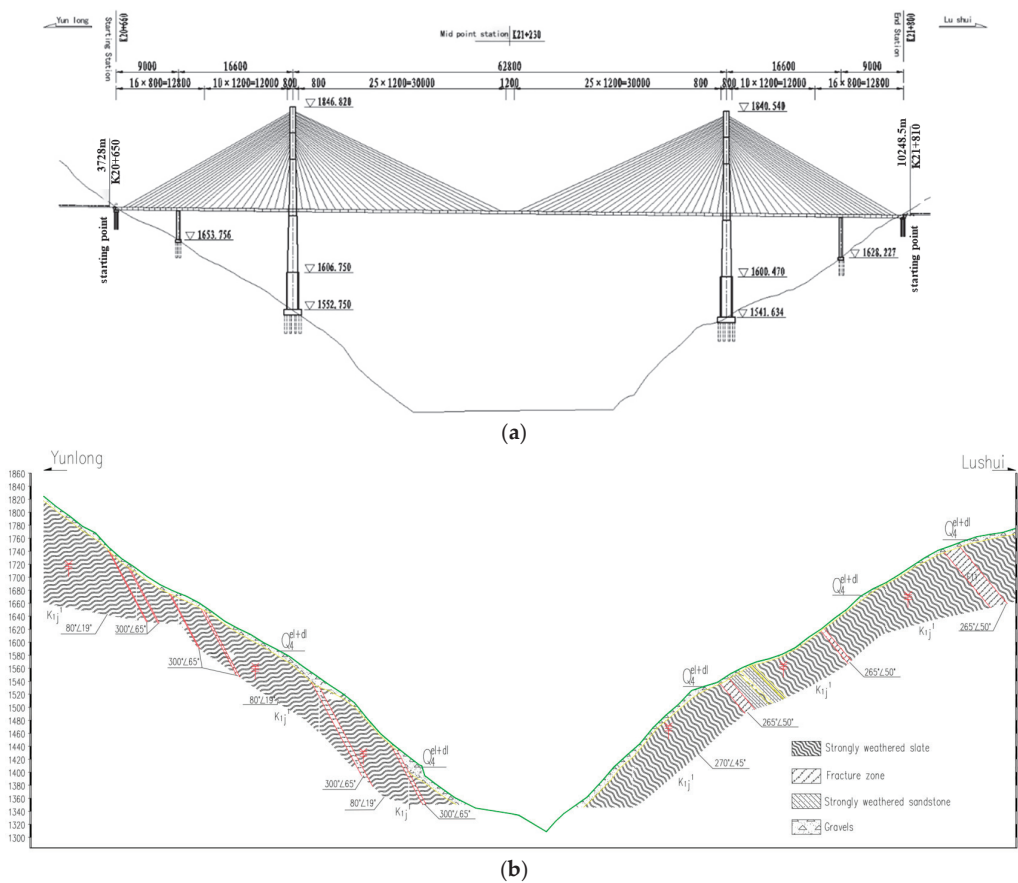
Schematic diagram of bridge location (scheme 1). (a) Schematic diagram of bridge type; (b) geological section of bridge site area.
